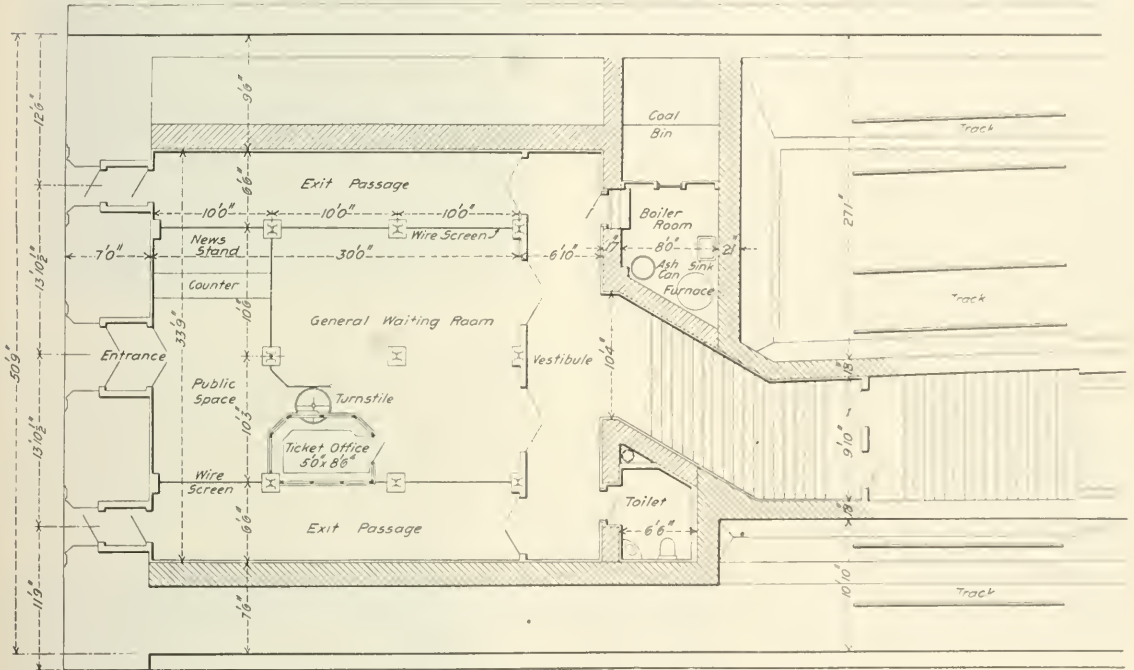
Details of Typical Elevated Railroad Station; Chicago Junction Railway.
